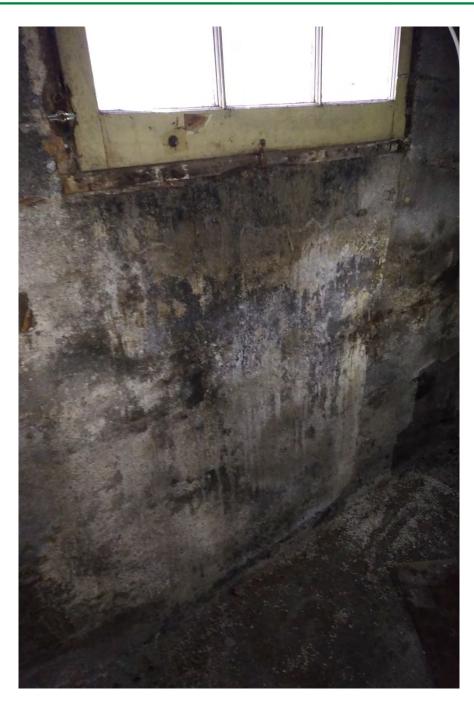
Interior of foundation wall, noted water damage and mould (174 Victoria St)
